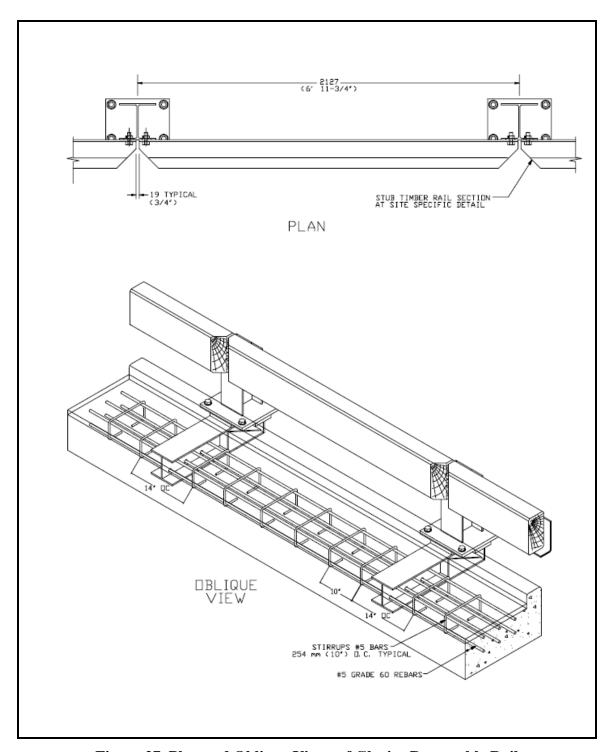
Plan and Oblique Views of Glacier Removable Rail
